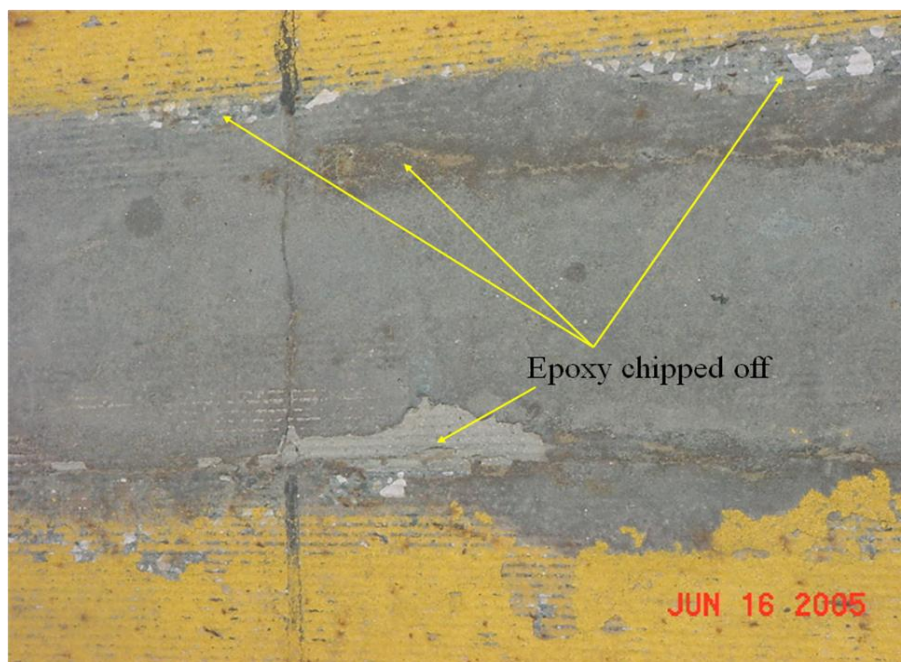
Damage to the Epoxy Coating along Bridge Centerline
